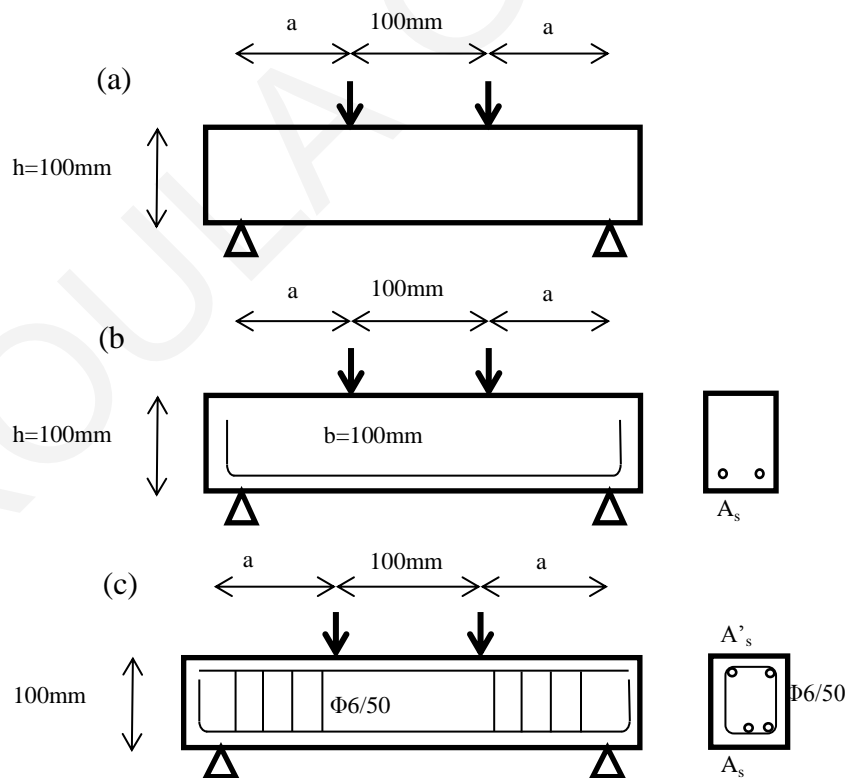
Test configuration for four point bending and reinforcement details for (a) specimens without reinforcement – beam strength controlled by the resistance of the cementitious composite; (b) beams with flexural reinforcement placed so as to increase the magnitude of shear demand in the beam shear spans; (c) beams reinforced with longitudinal bars and stirrups for shear strength.
